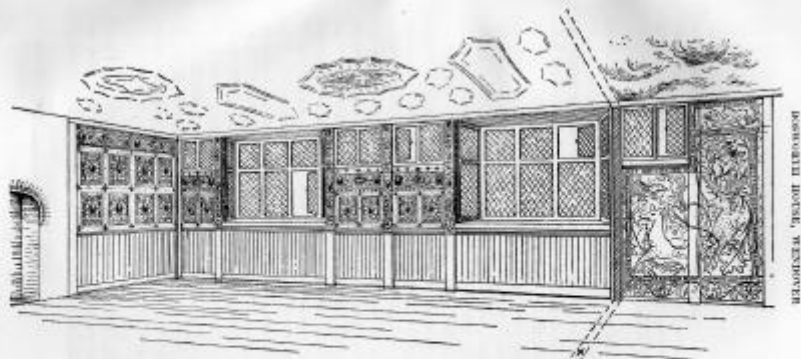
Diagrammatic Restoration of Upper Floor of No. 2, with the Passage connecting the two buildings. The east partition wall omitted; its position shown by X.
